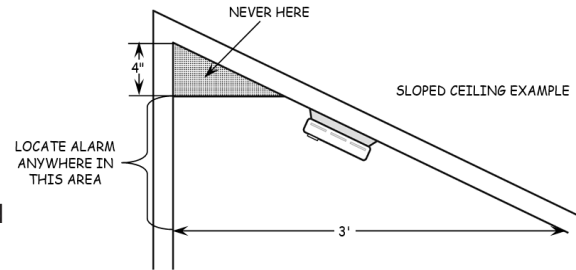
ALARM PLACEMENT ON SLOPED CEILING
